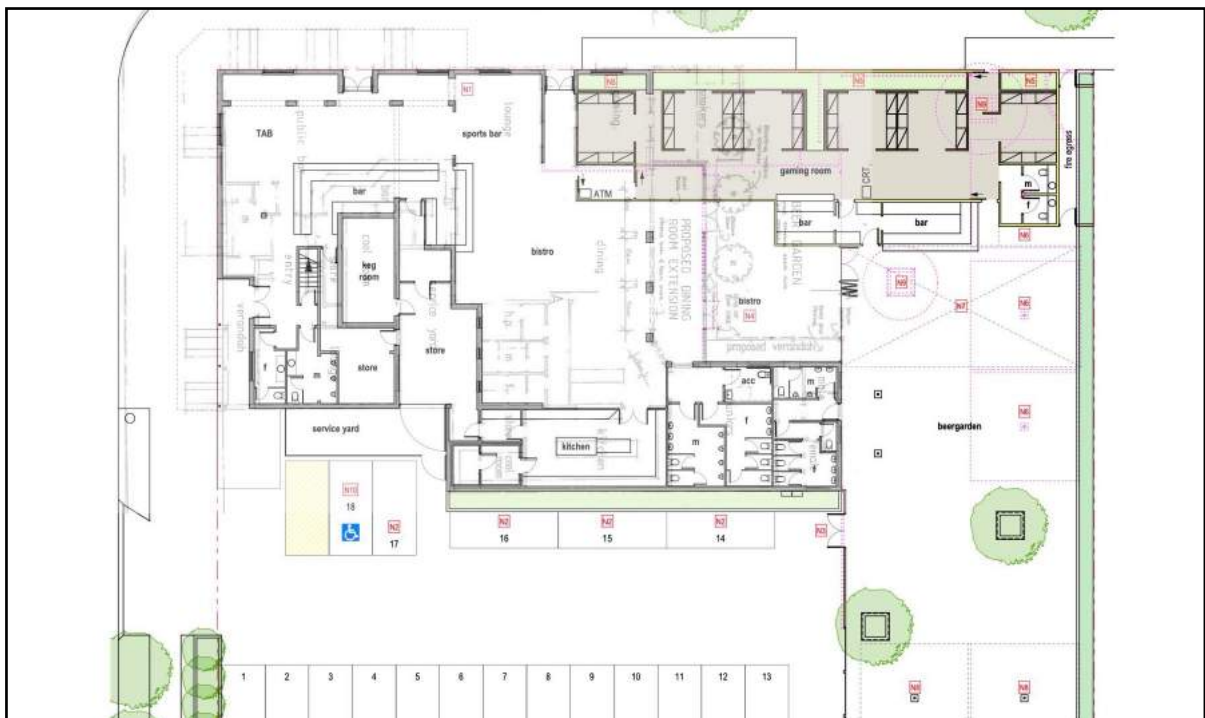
Floor plan overlay comparison - 2008 Approved & 2023 Proposed (Source: SP & DMD 2023)
